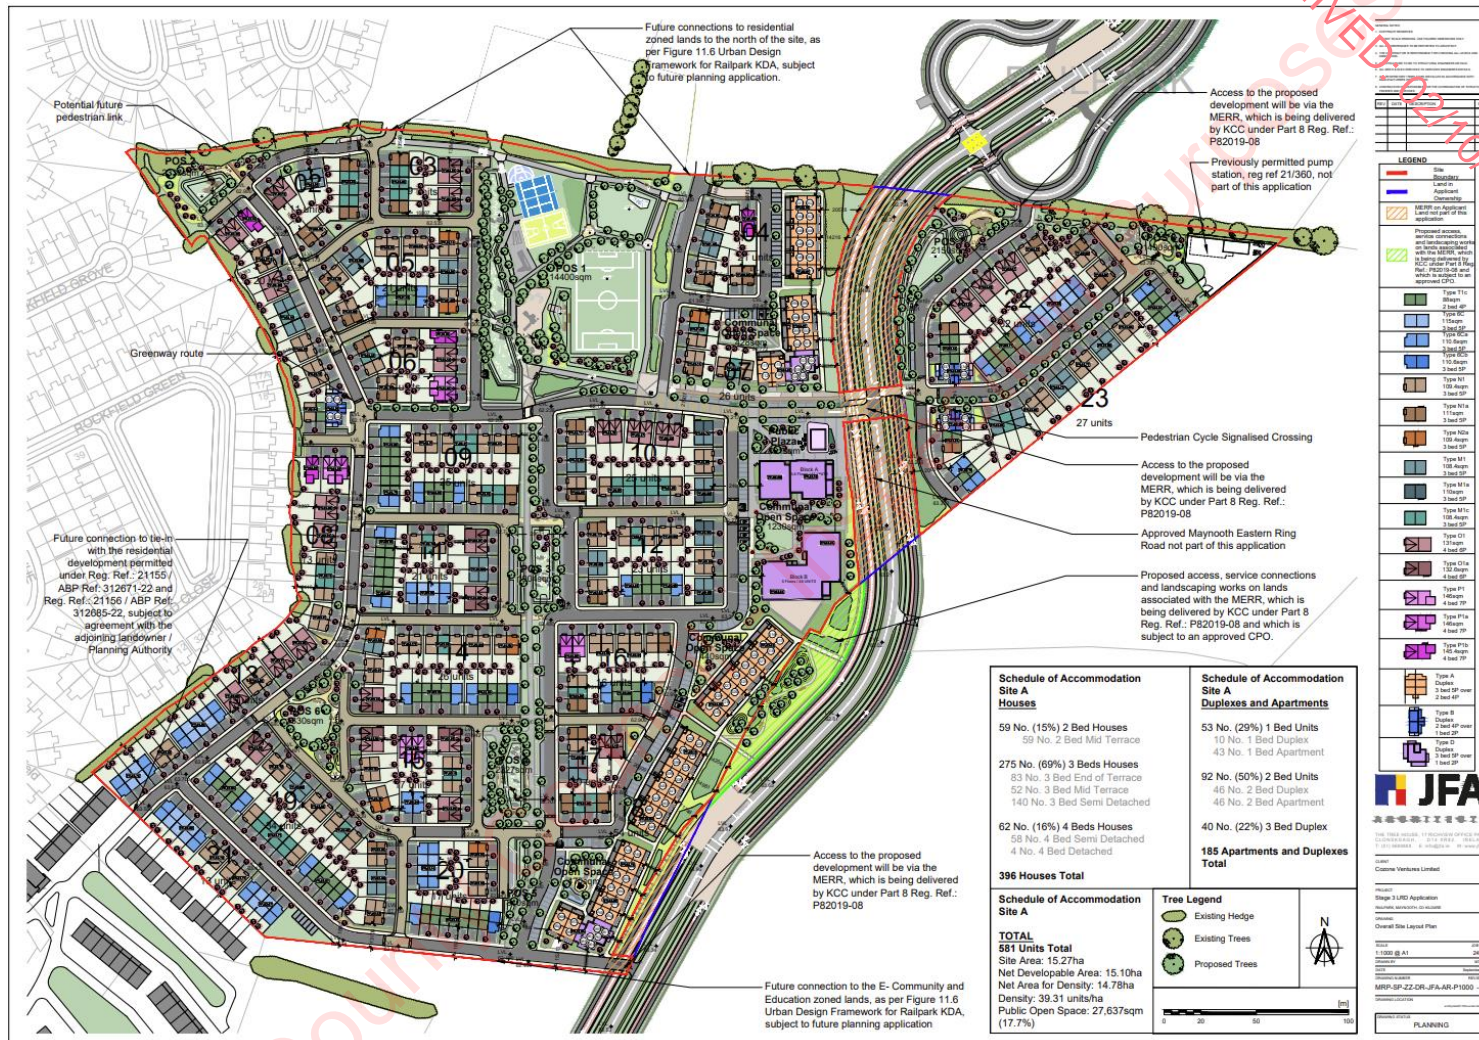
PROPOSED SITE LAYOUT (JFA ARCHITECTS, 2025, DRAWING NO. MRP-SP-ZZ-DR-JFA-AR-P1000).
